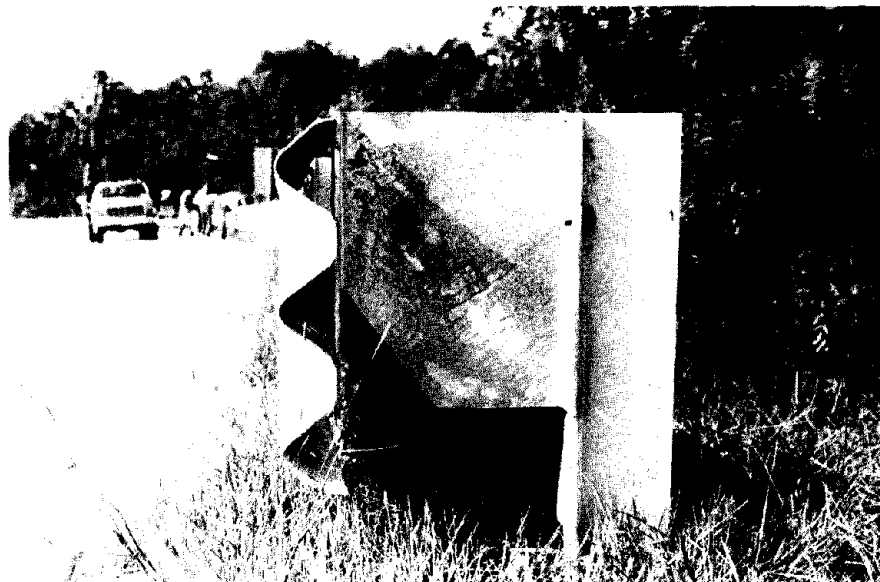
View during construction showing modified spacer block, thrie beam rail and steel post.
